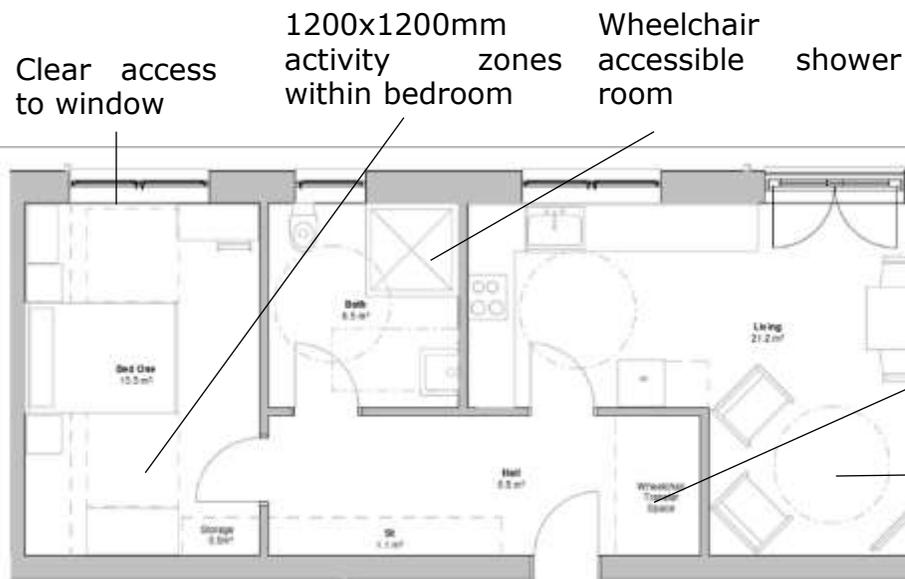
Typical Sheltered Flat Layout to M4(3) Standard
